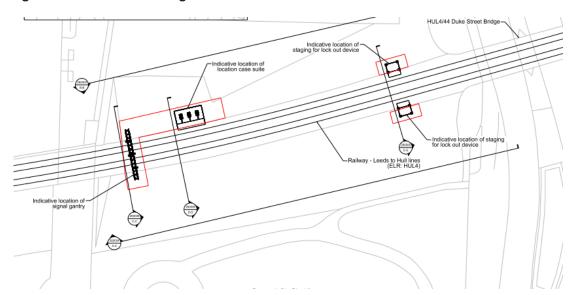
Site layout plan of Kirkgate to Marsh Lane Land
